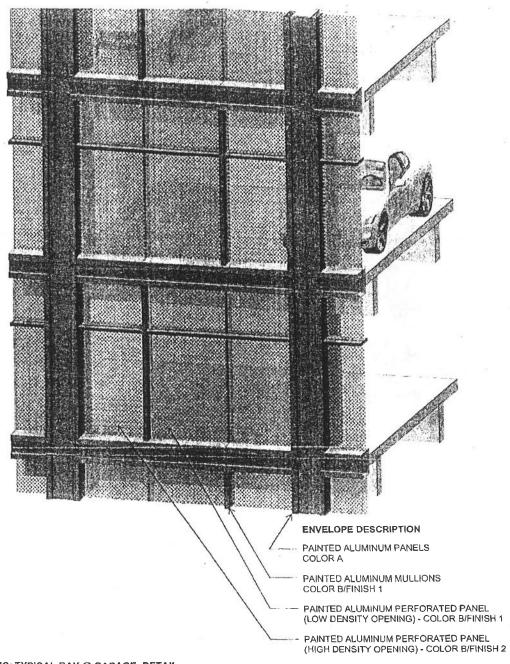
C: TYPICAL BAY @ GARAGE- DETAIL
